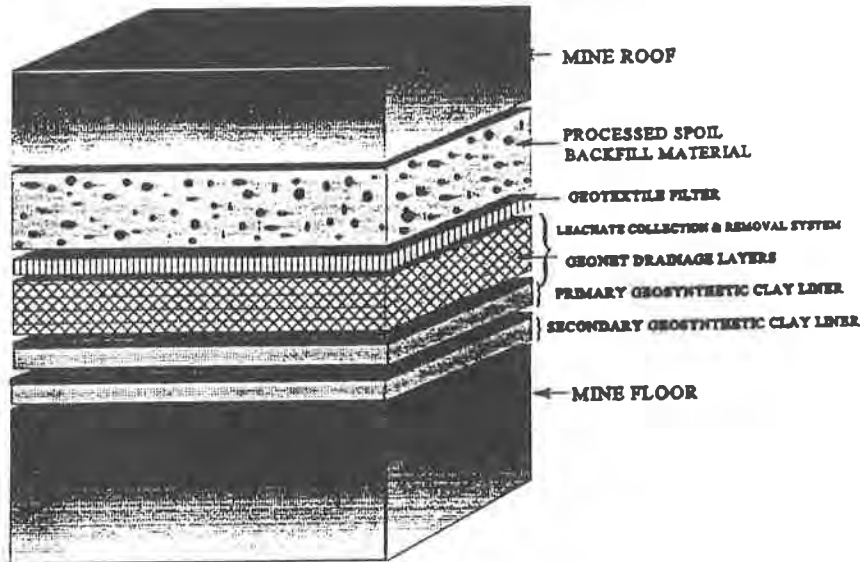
Recommended bottom barrier for remote longwall mining in situ containment.
